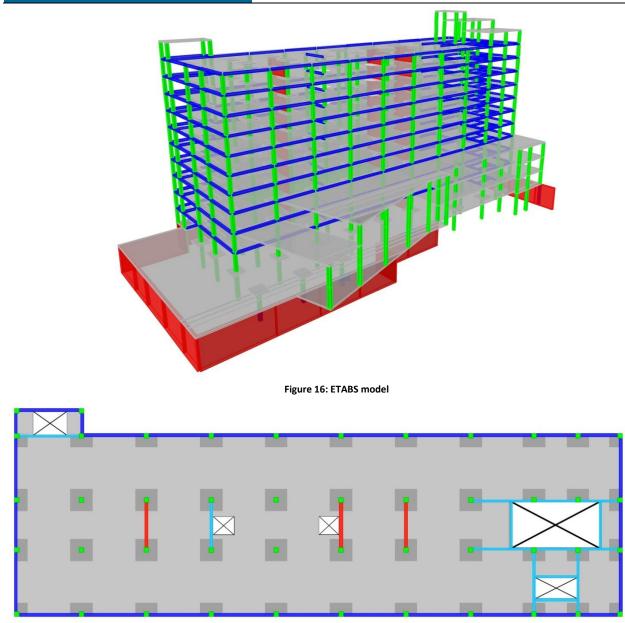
ETABS floor plan (Columns – green, Shear walls – red, Edge beams – dark blue, Interior Beams – light blue, Drop panels – dark gray)
